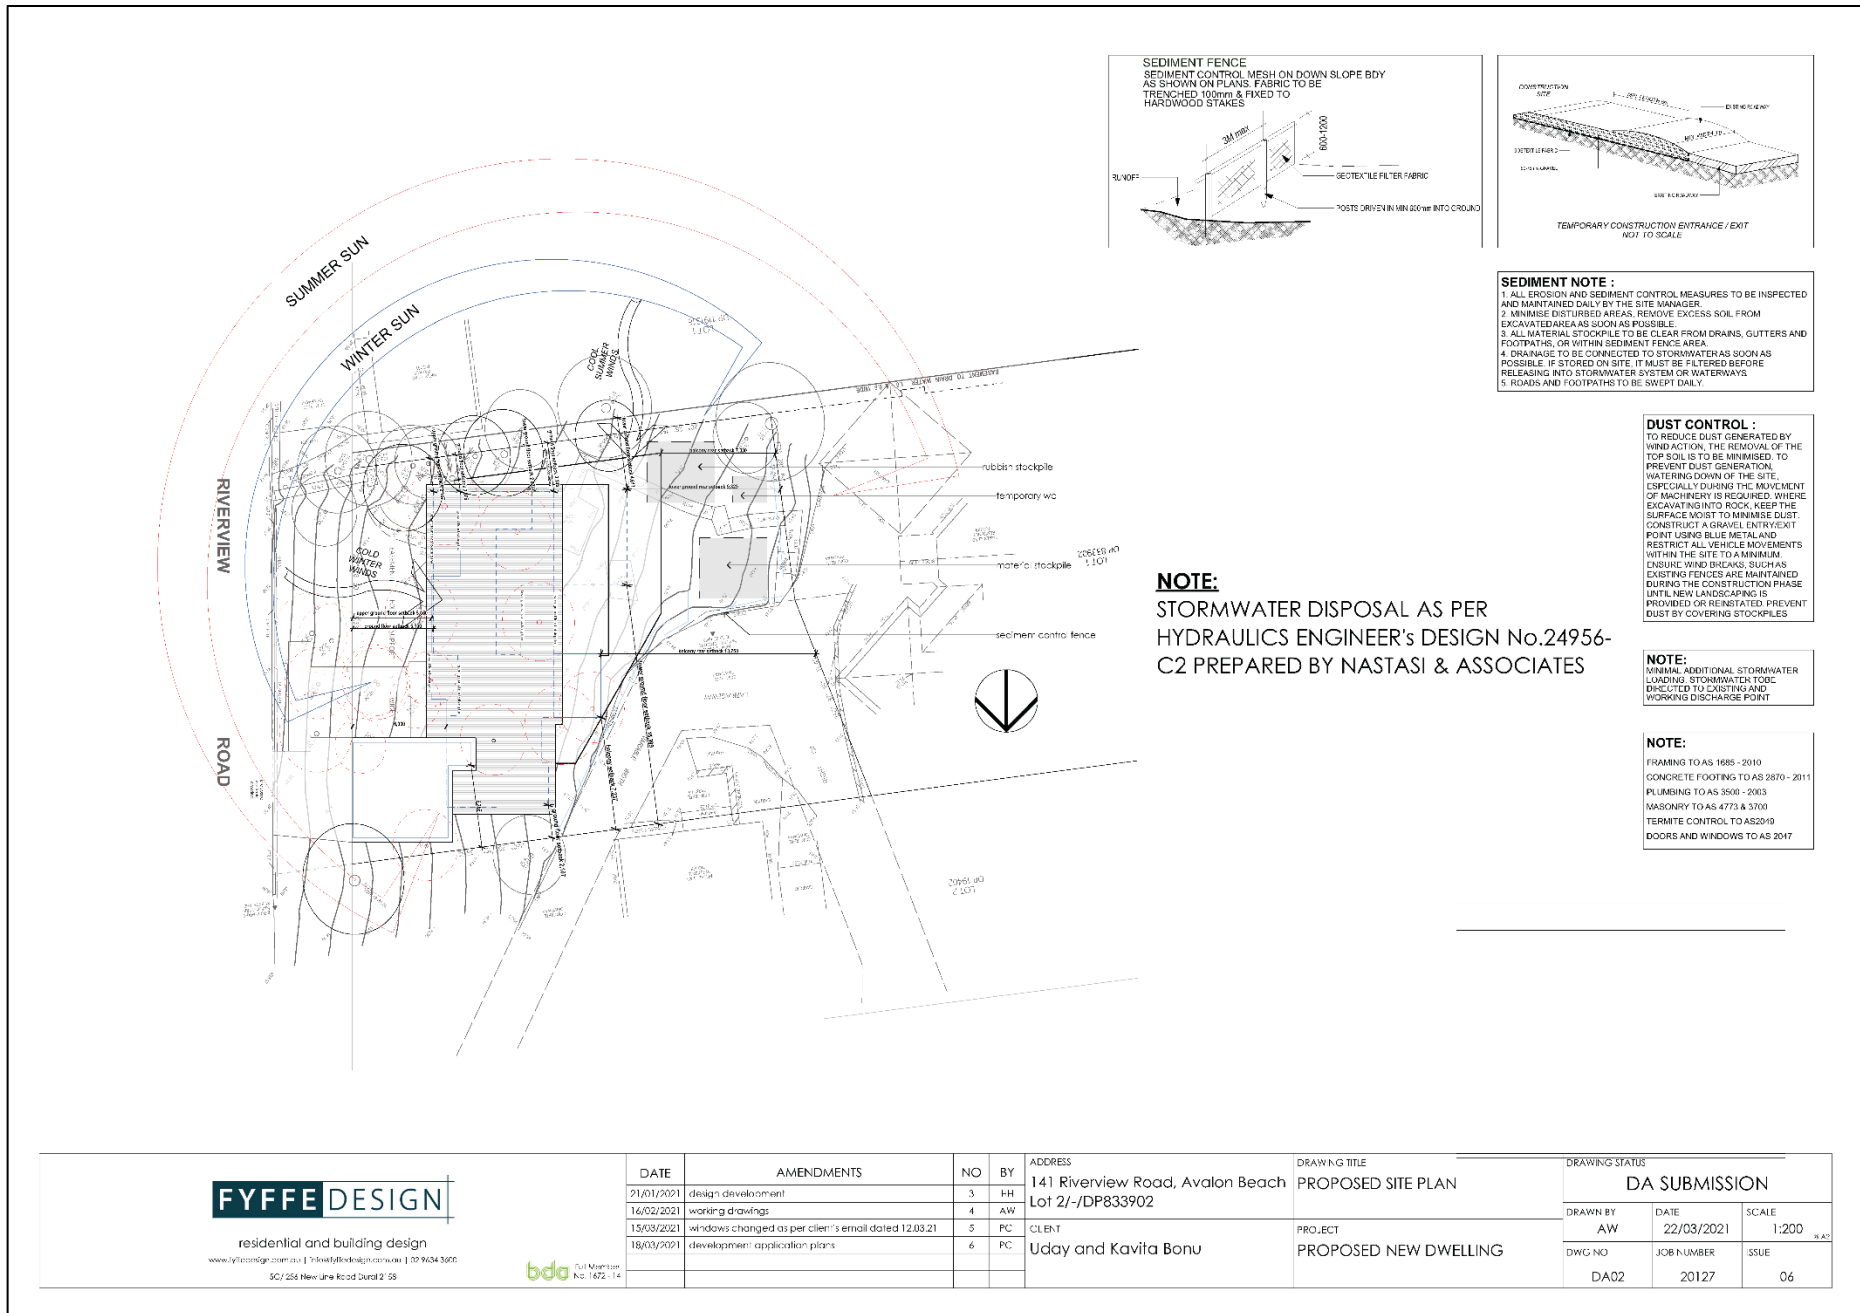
Proposed Site Plan (Fyffe Design 2021).
